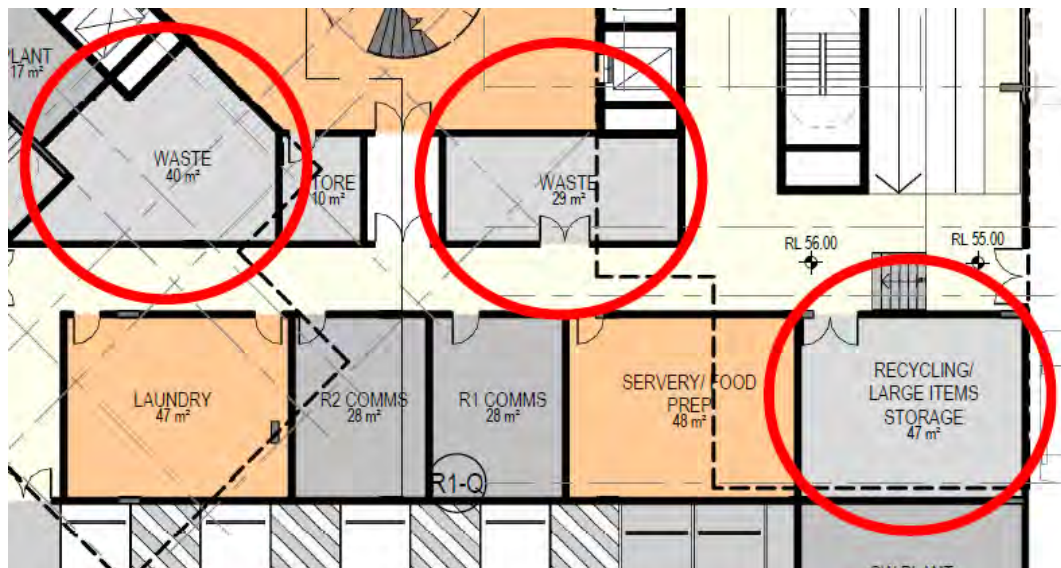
R1 – 2 central waste and recycling storage rooms on Basement 1.
